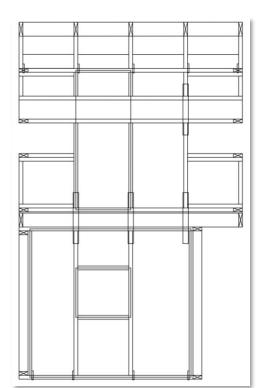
Sample AutoCAD Framing Plan; Cantilever Beam Not Pictured [3]
